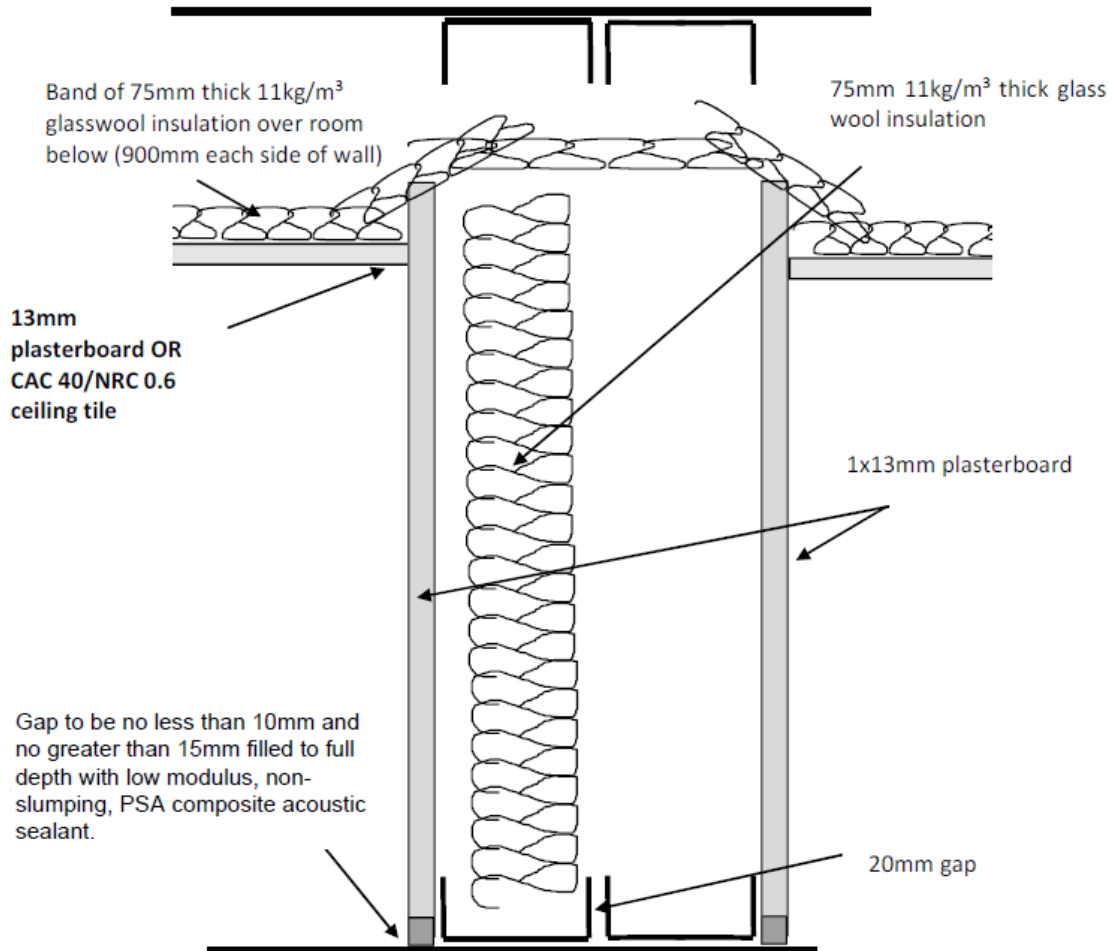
Rw45 (Operating Theatres) Wall Construction
